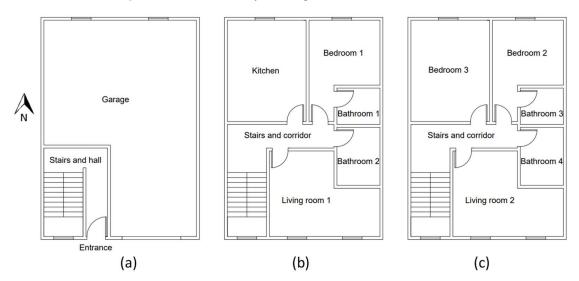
Layout of all the study building floors: (a) ground floor, (b) first floor and (c) second floor.
